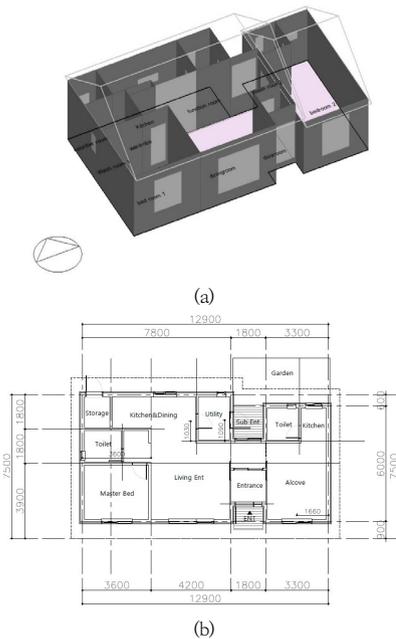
Geometry of the Prototype Detached House (Nonglim-10-27-DA-1) (a) Perspective View of Design Builder Model (b) Plan of the House
